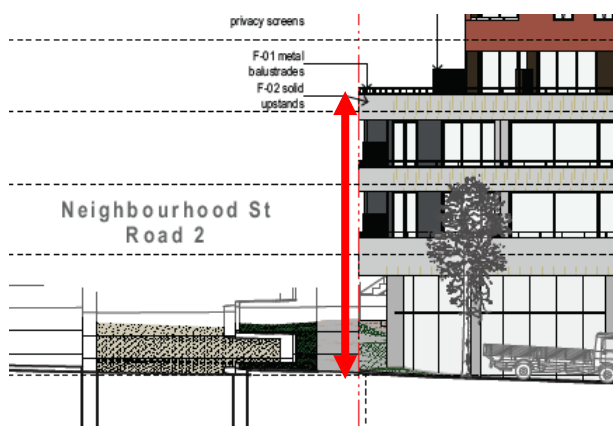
Block C3 – 3 storey street wall height to Neighbourhood Street 2
